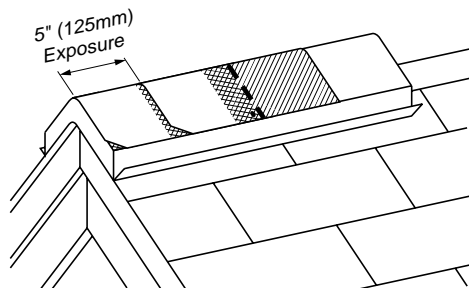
Expose cap shingles 5" and cover all fasteners.
